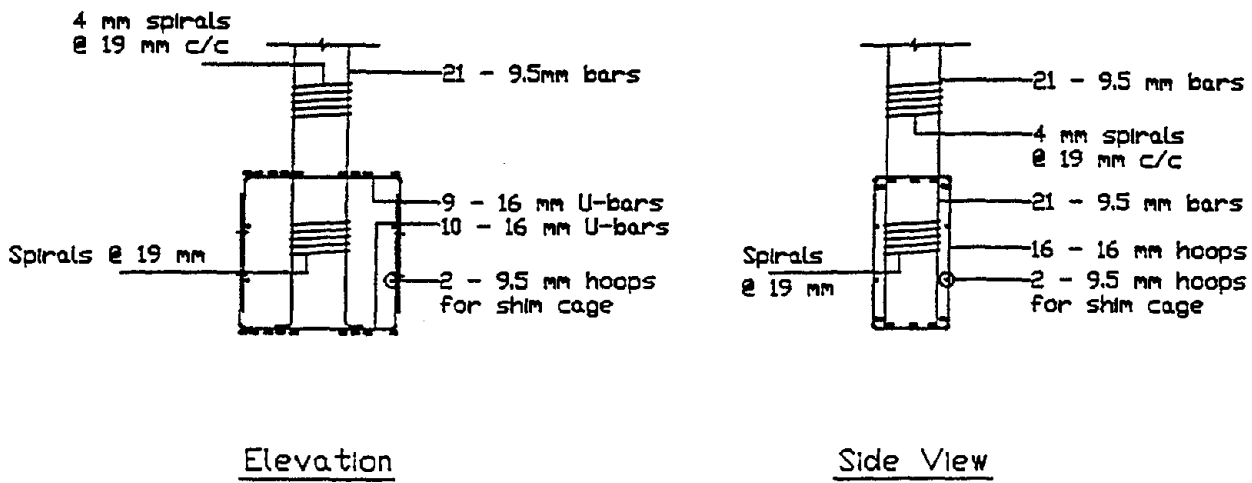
Reinforcement Arrangement for Specimen with Base Block
